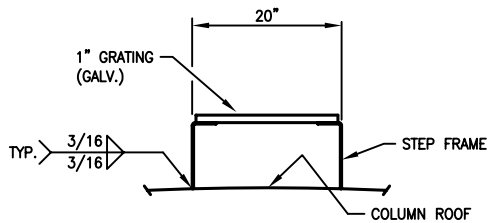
DETAILED VIEW OF P2 TO COLUMN ROOF LADDER
